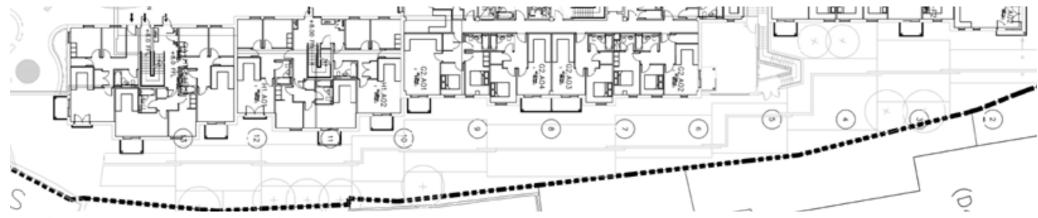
Benoy approved layout to East Street featuring upper level balconies
